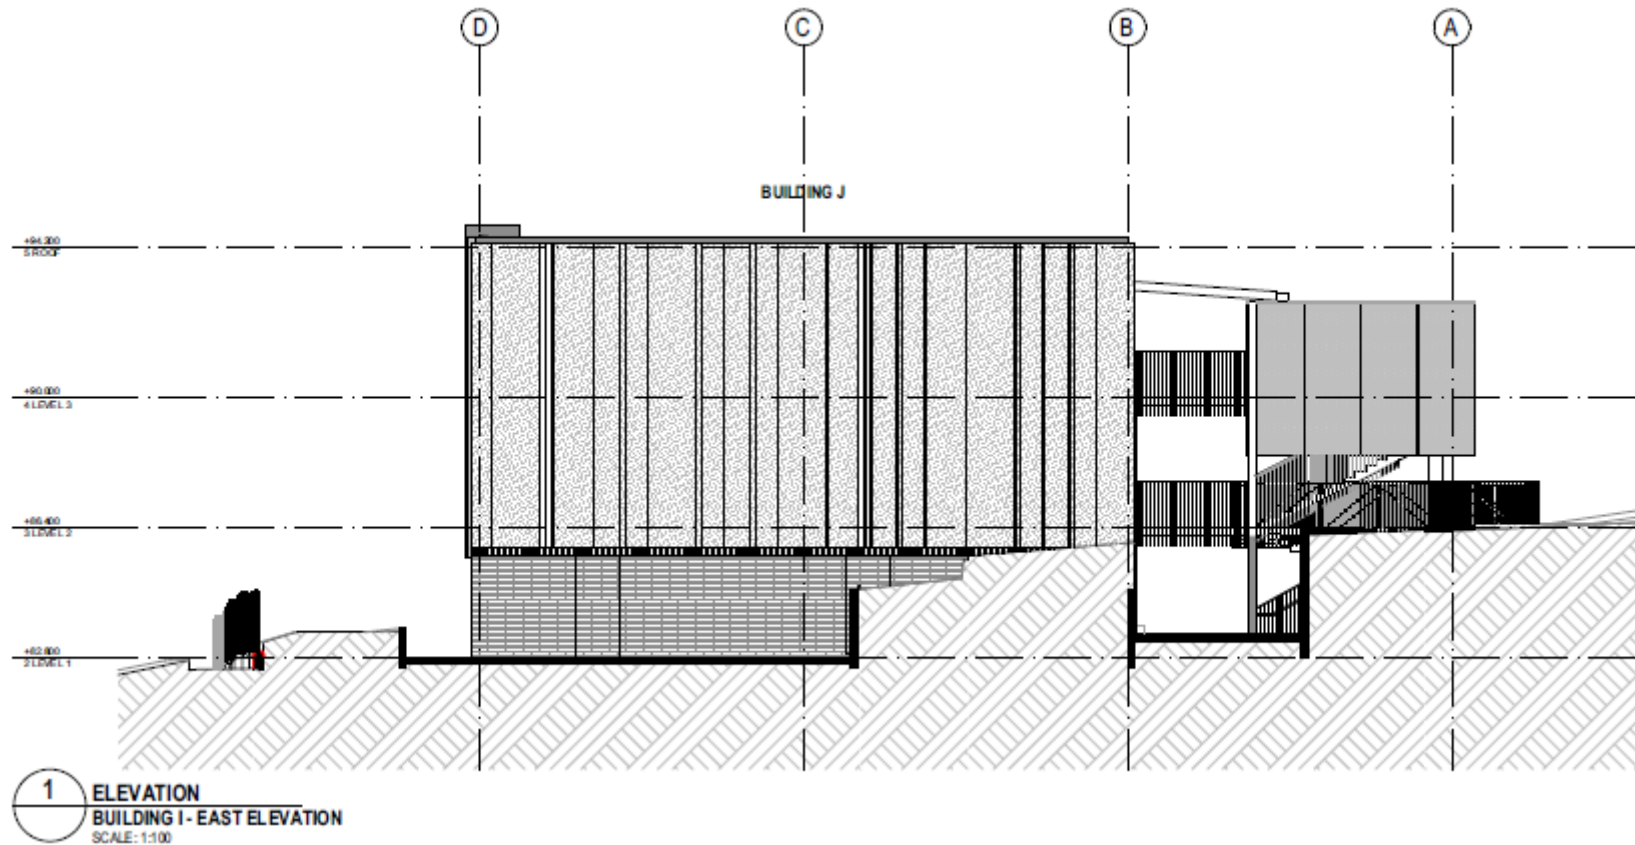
Proposed Building I East Elevation. Source: Fulton Trotter, 2021
